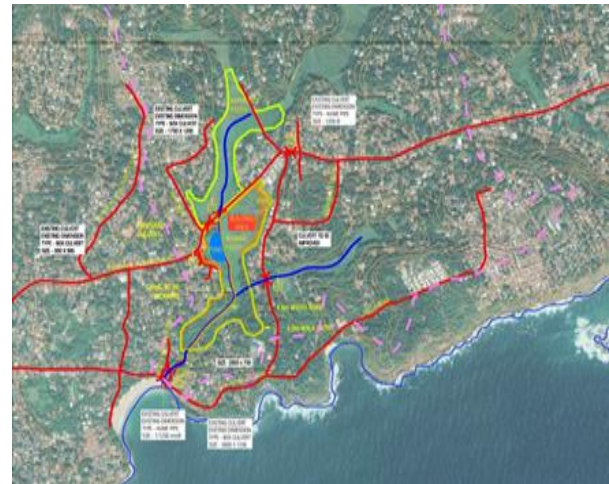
Proposed Conceptual Drainage Plan (before receiving new UDA layout)
